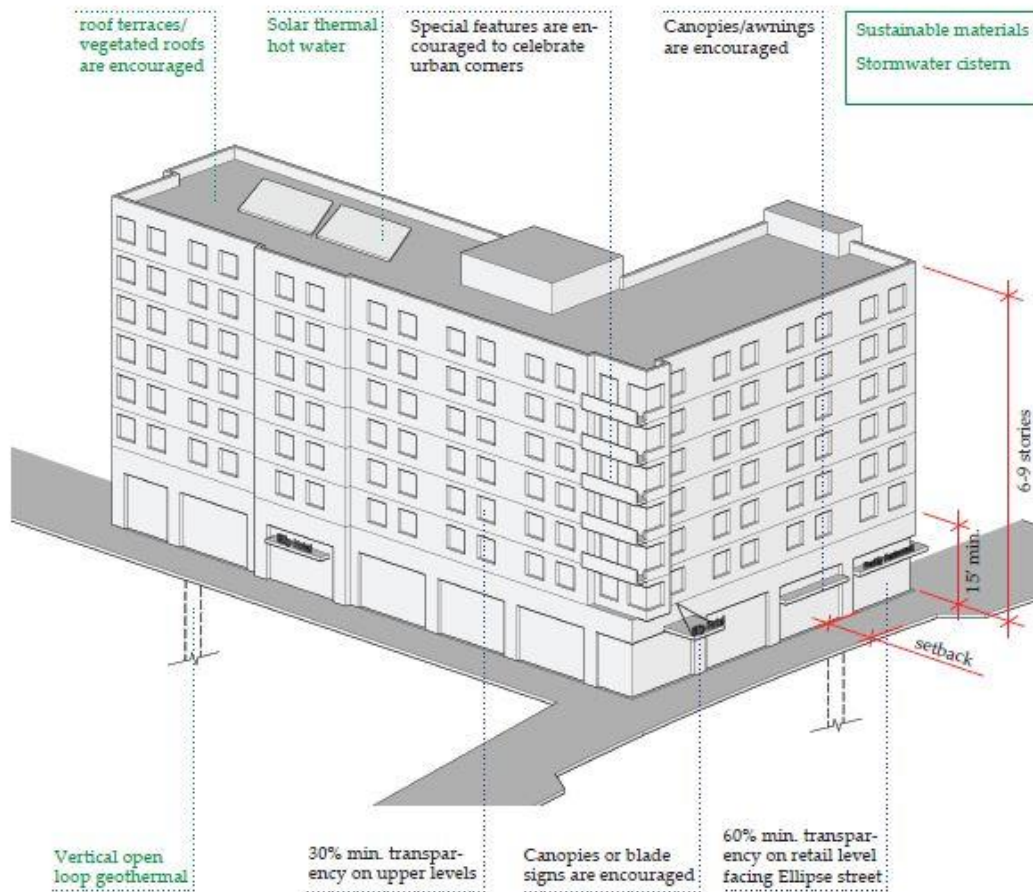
Mixed-use hotel buildout example, source: (EDAW Inc., 2009)
